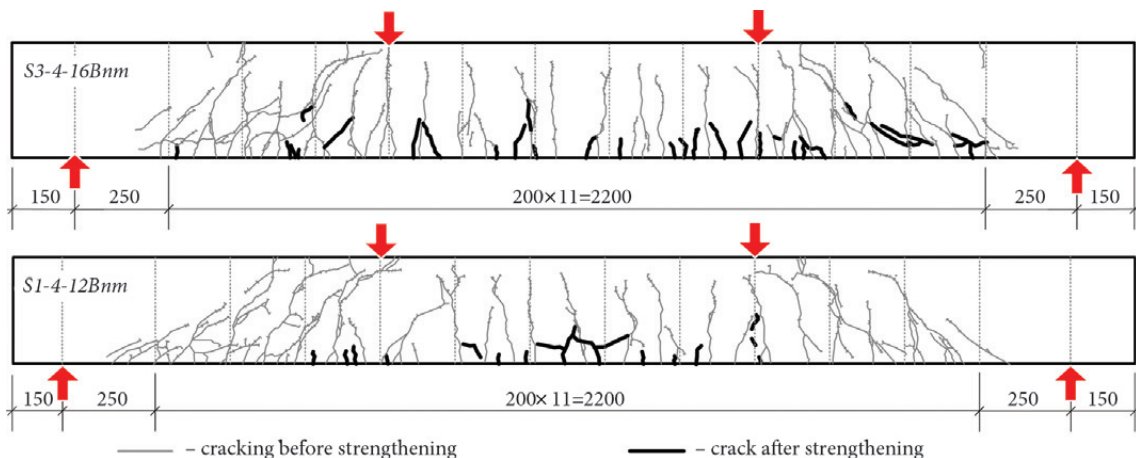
Crack pattern of the tested specimens (measurements in mm)
